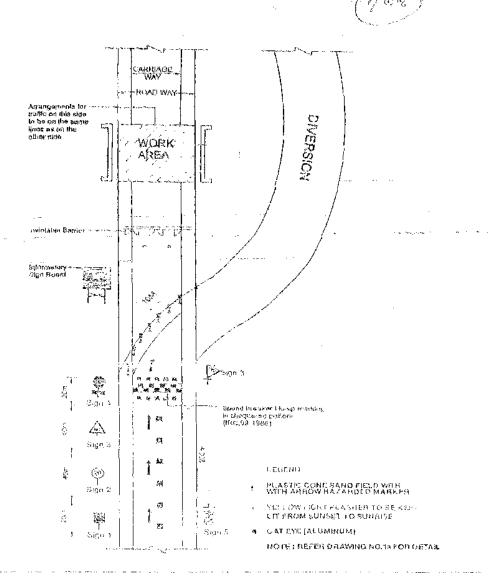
Arrangements During Construction / Reconstruction of Roads & Bridges where Traffic is to be Passed Over a Diversion
